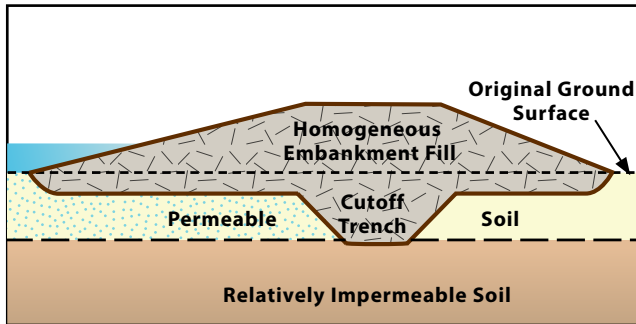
Cross Section of Embankment with Cutoff Trench
